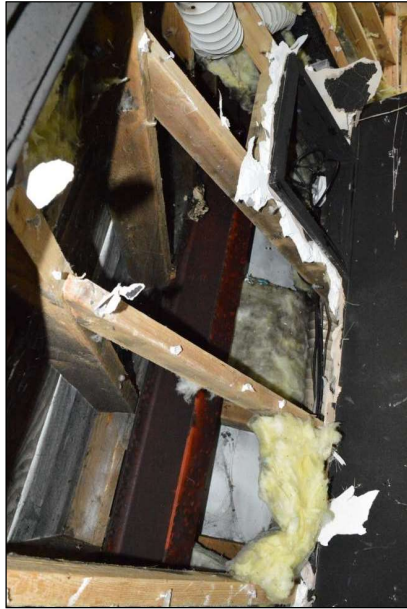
Steel beam supporting the ridge in bedroom 2 (CPAT 4900-0052)
